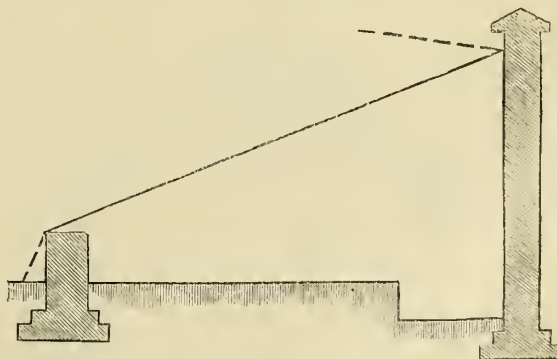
WIDE LEAN-TO HOUSE WITH LOW ROOF.
